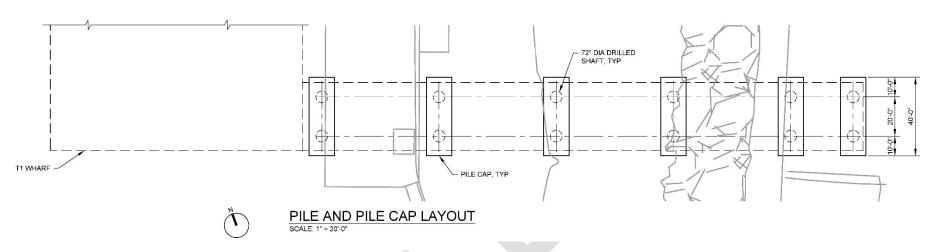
Pile Layout for T1 Access Trestles: Alternative 2B with 72-inch-diameter Drilled Shafts
